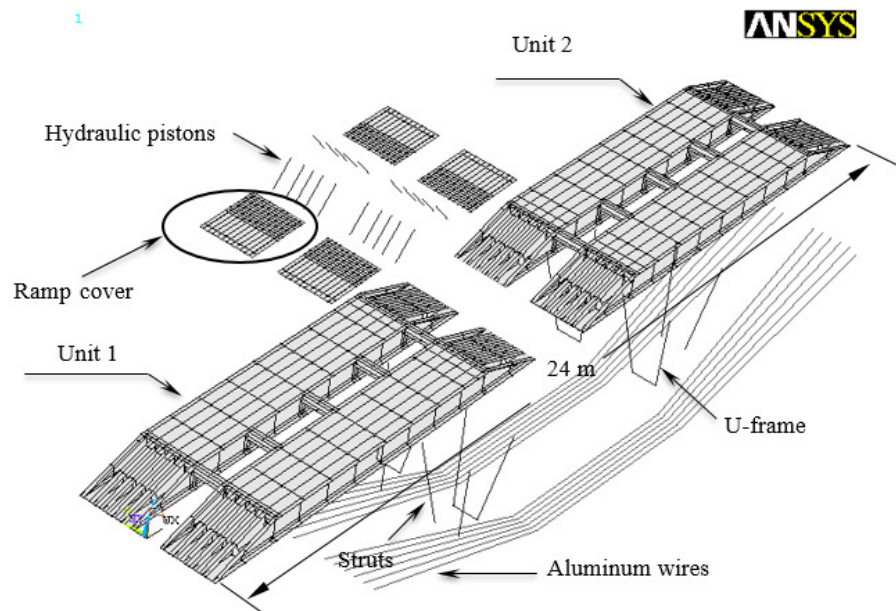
An exploded view of the 24 m bridge assembly (Osman, 2006)
